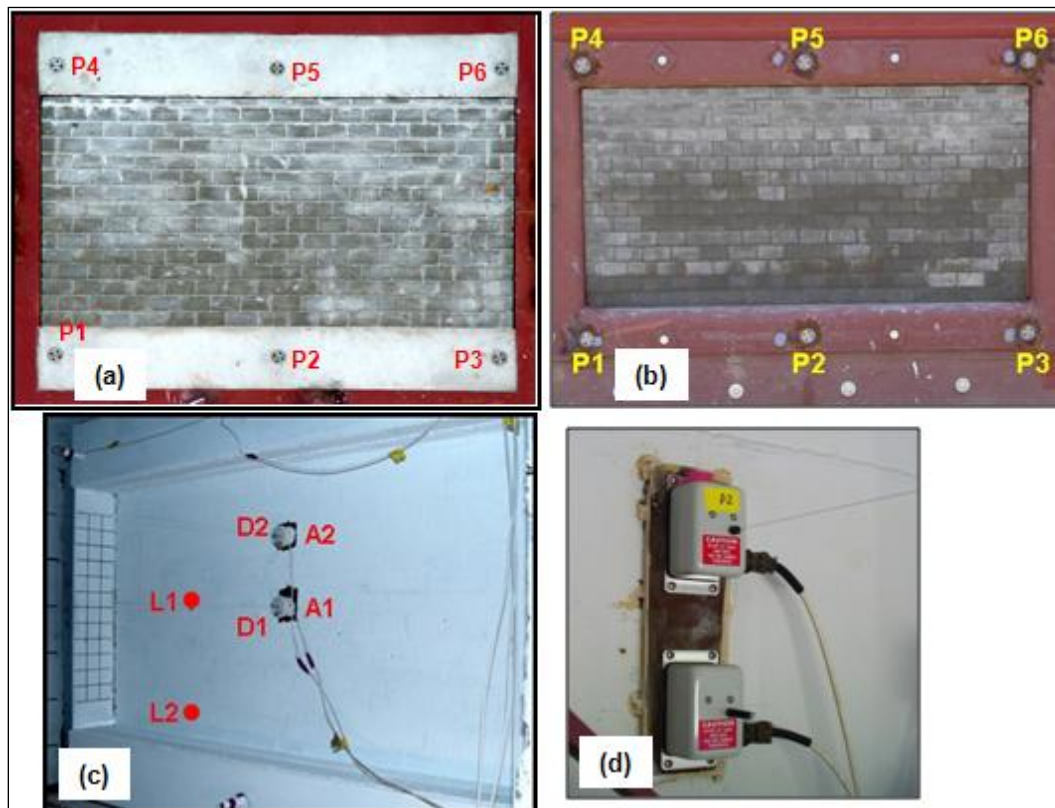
Instrumentation used in dynamic experiments. (a) Pressure gauge layout for subscale CMU wall in concrete frame. (b) Pressure gauge layout for CMU wall in steel frame. (c) Accelerometer, laser, and wire deflection gauge layout on CMU wall. (d) Precision potentiometer and wire deflection gauges.
